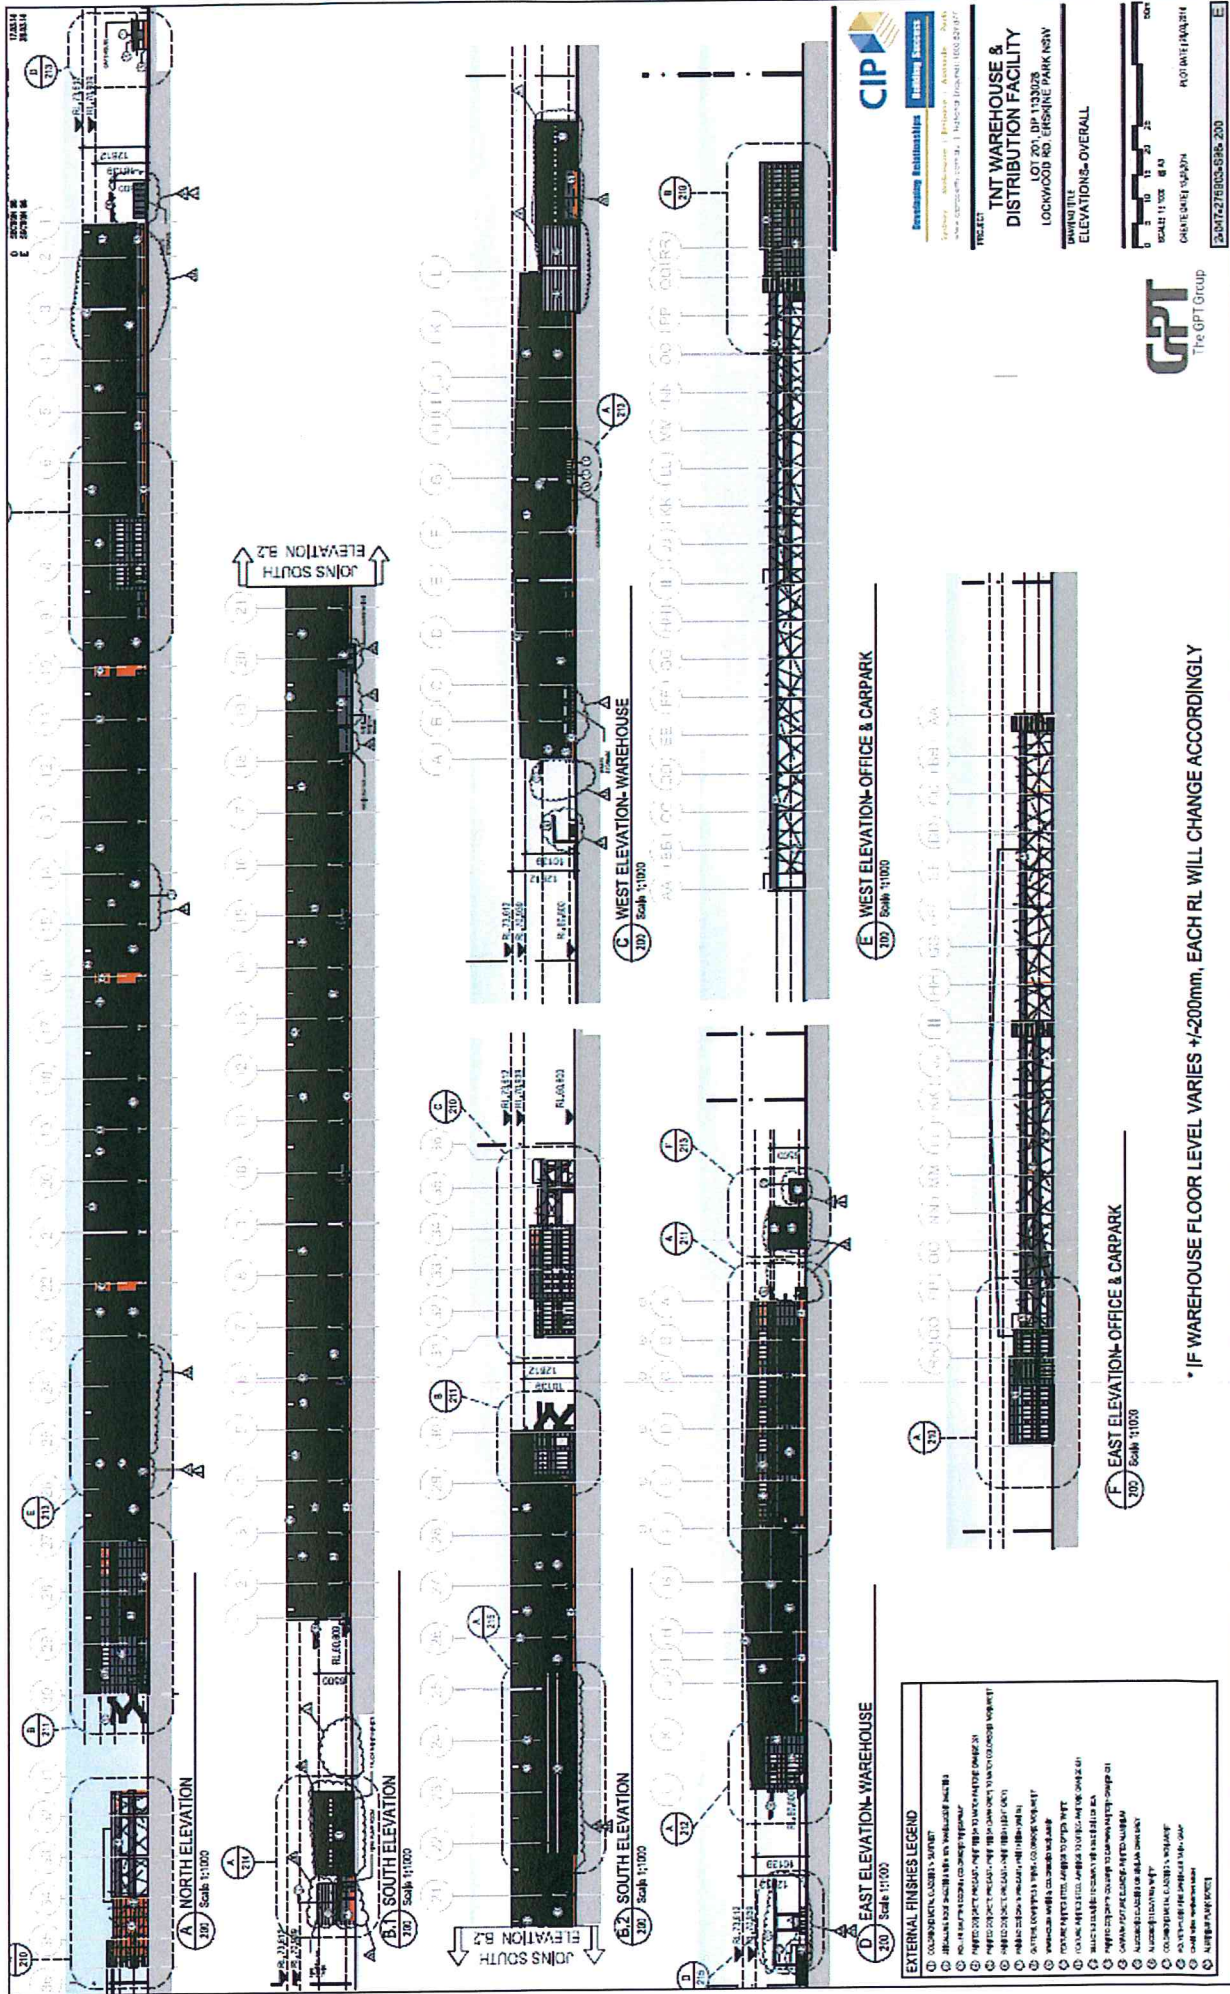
Proposed Elevations (Plan No. S96-200-E) (Amended by SSD 6040 MOD 2)
